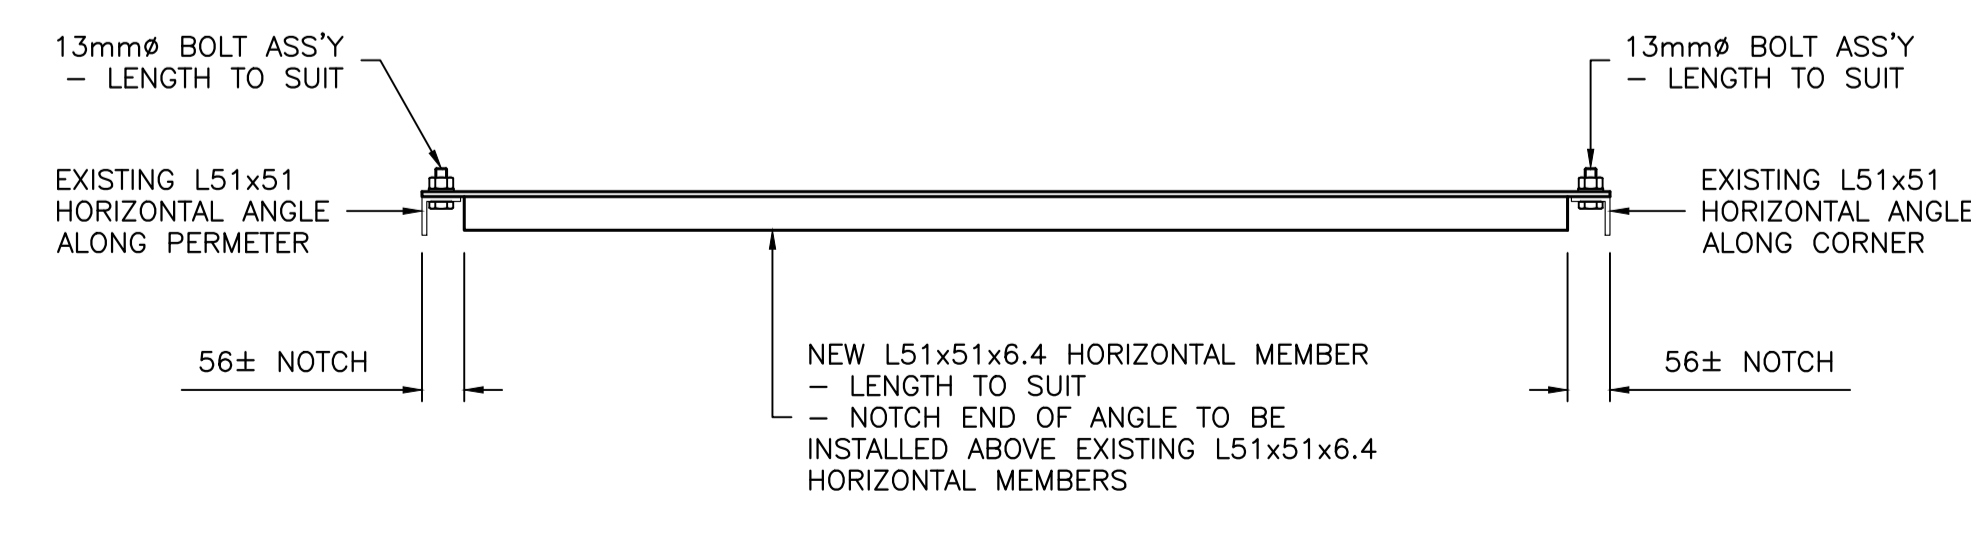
DETAIL - SAFTY NET ANGLE BRACE ALONG CONCRETE EDGE (E) 6
